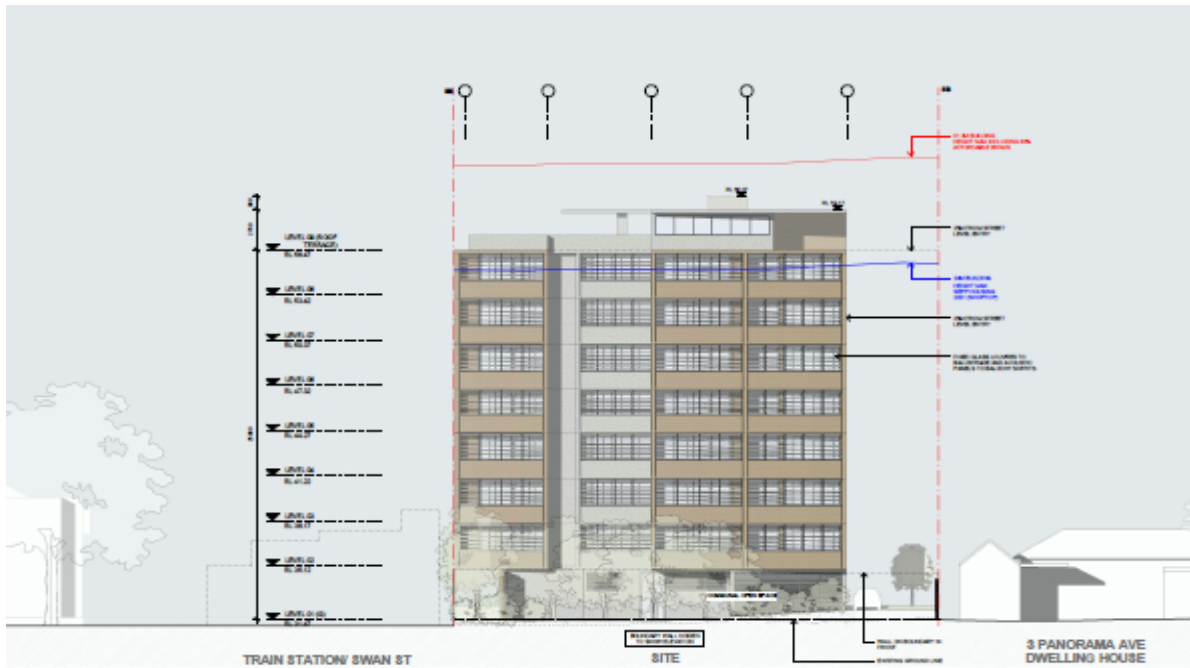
View from the north- proposed concept next to the existing 1 storey dwelling to the right (Source: Stanisis Architect, 2025)
